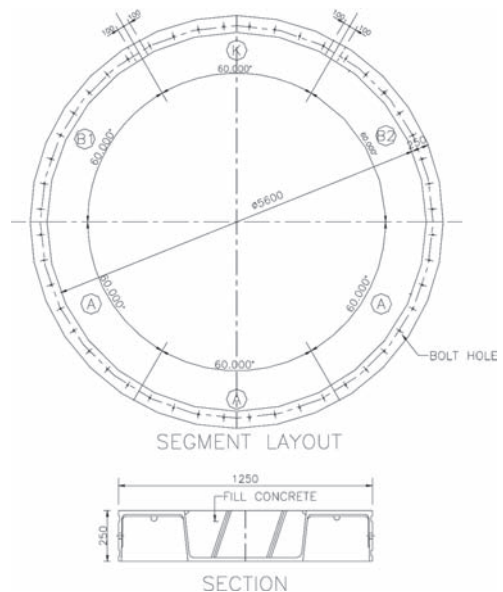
Typical layout of cast iron lining segments (after Kang *et al.* 2007).
